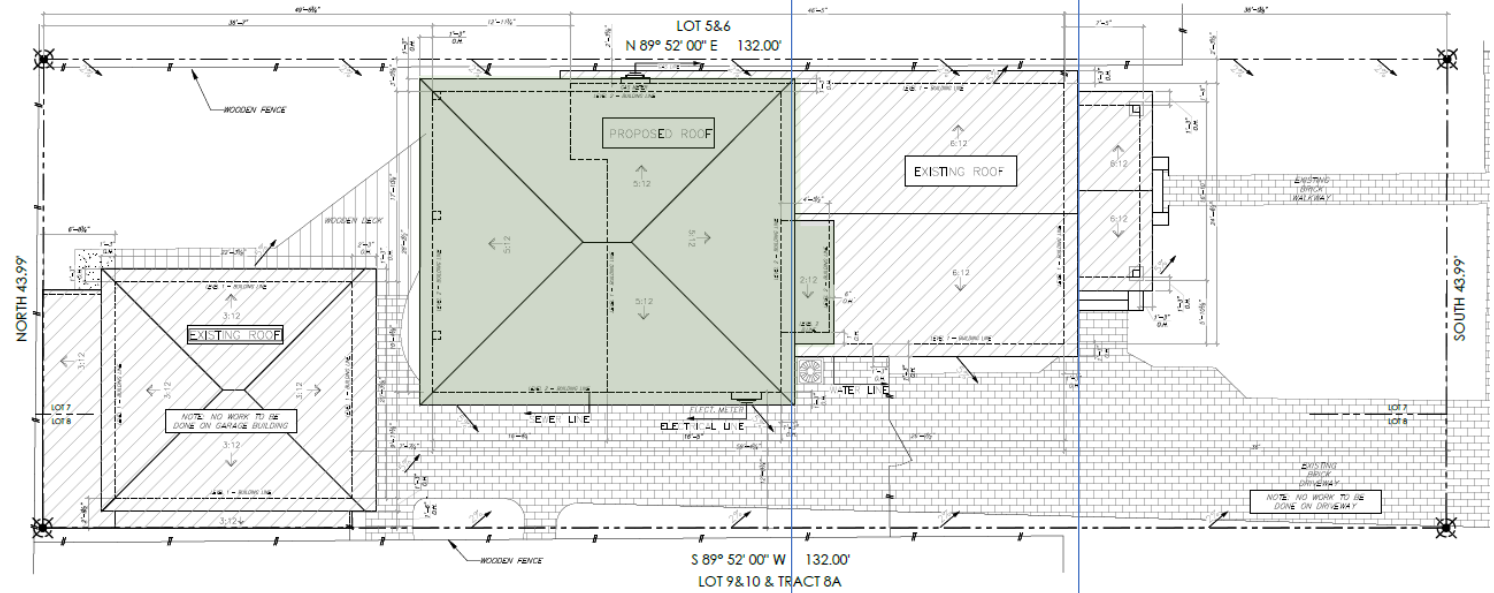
Proposed Roof Plan 2 story rear addition starts at existing 1st floor addition
